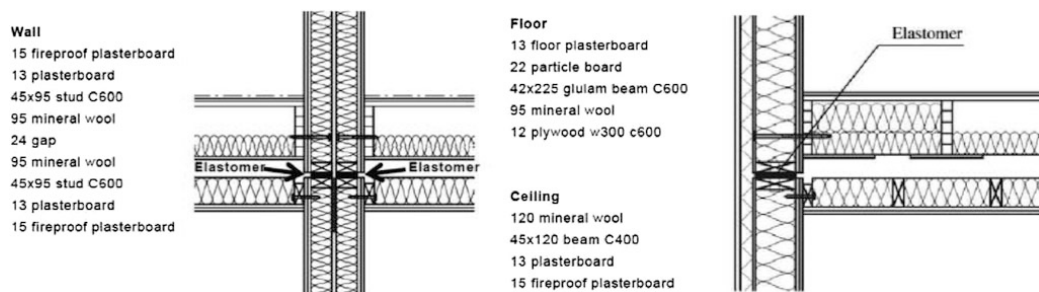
Drawings of the TVE building system, showing sections of a floor-ceiling structure and junctions with an apartment separating wall (left) and a facade wall (right)
